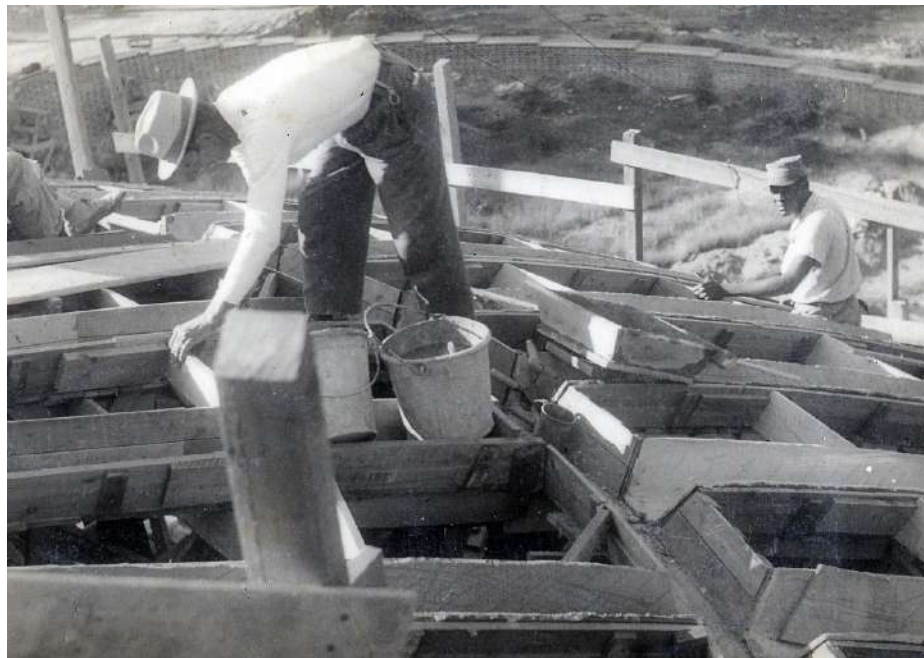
The wooden scaffoldings installed for the construction of the School of Ballet's dance pavilions (ISA archive).
